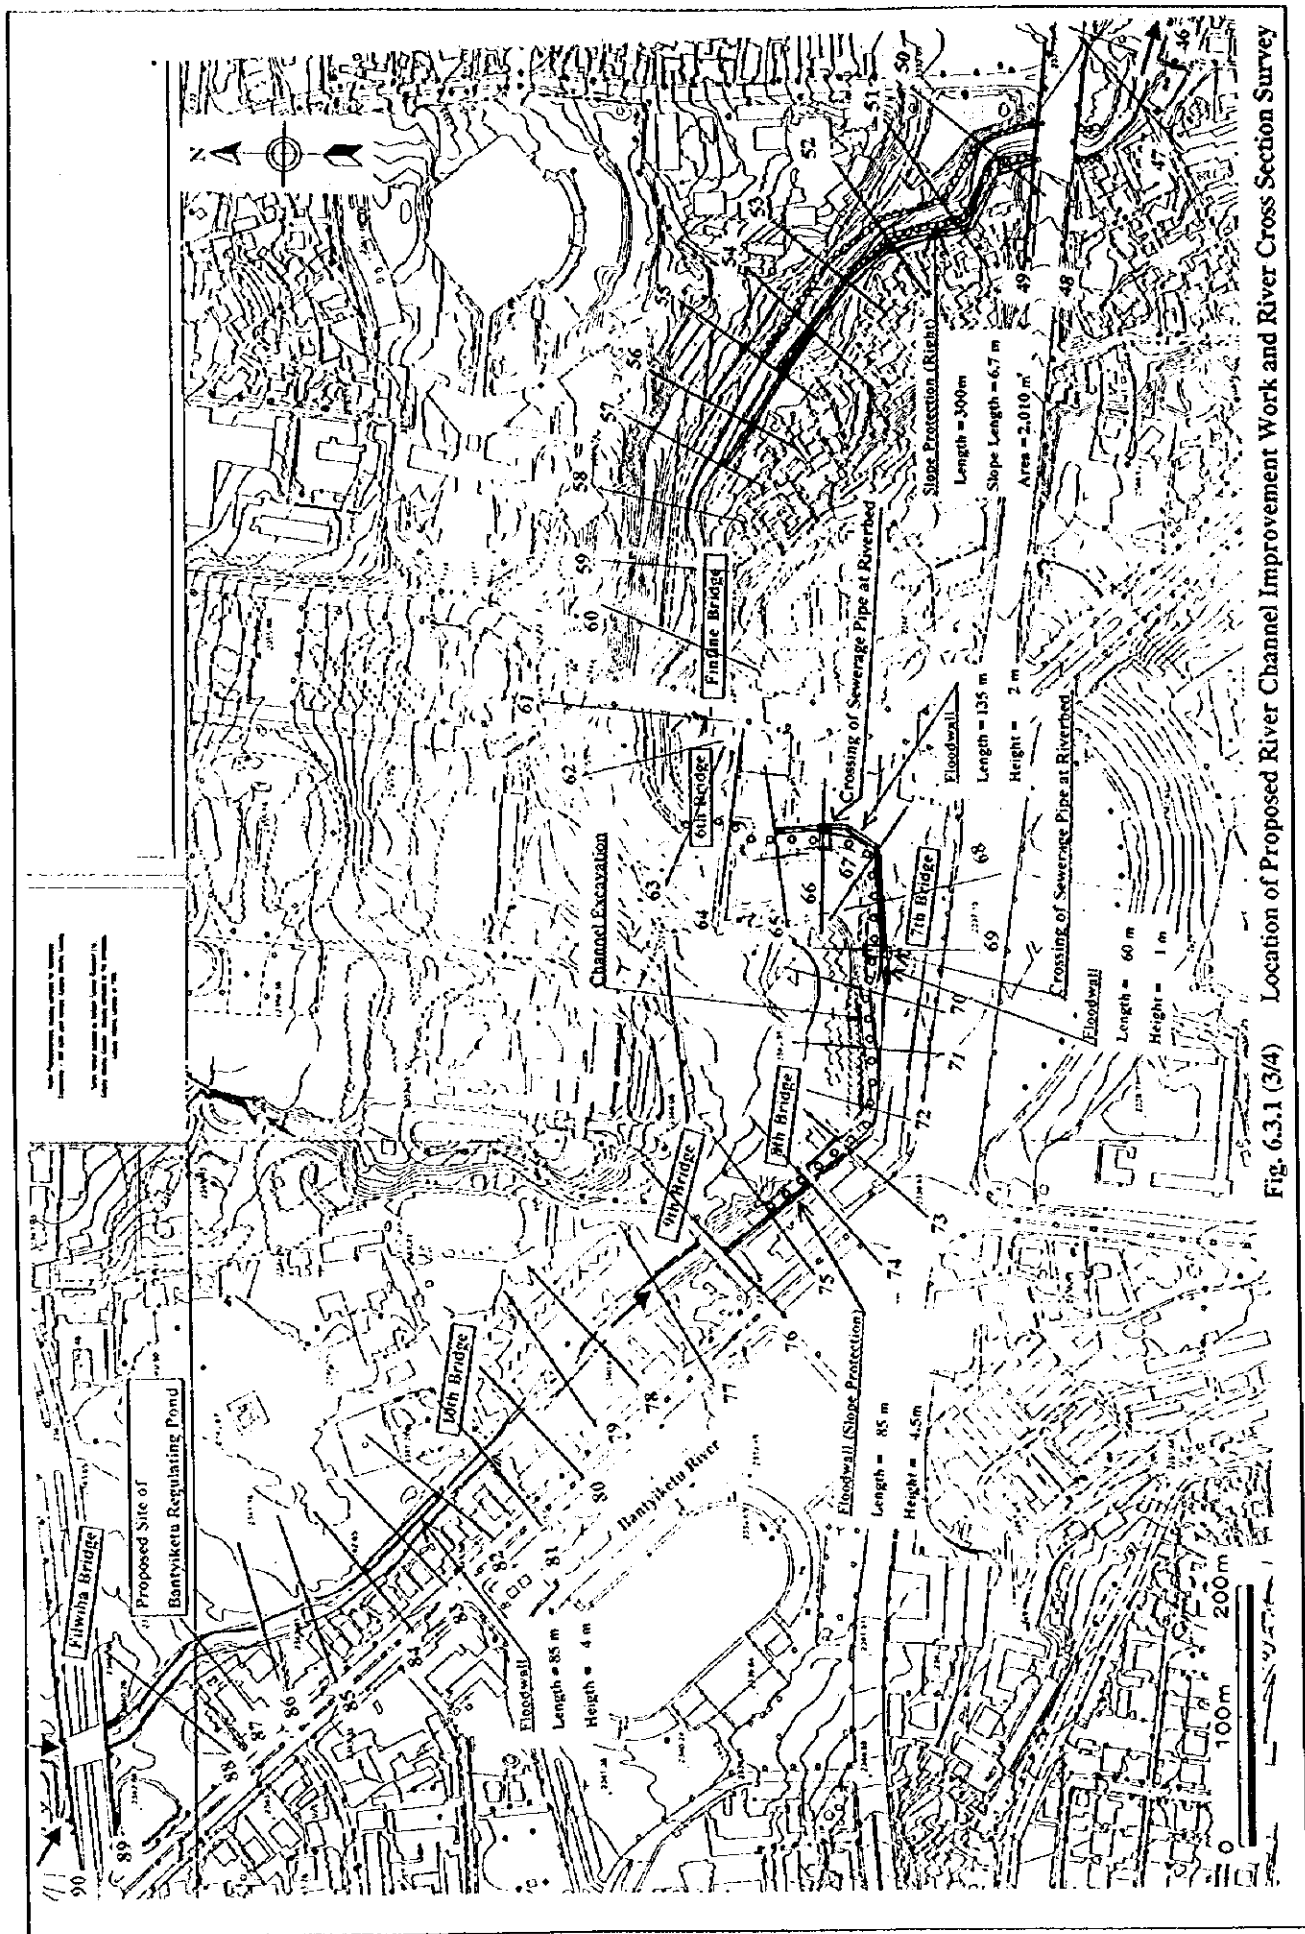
(3/4) Location of Proposed River Channel Improvement Work and River Cross Section Survey
